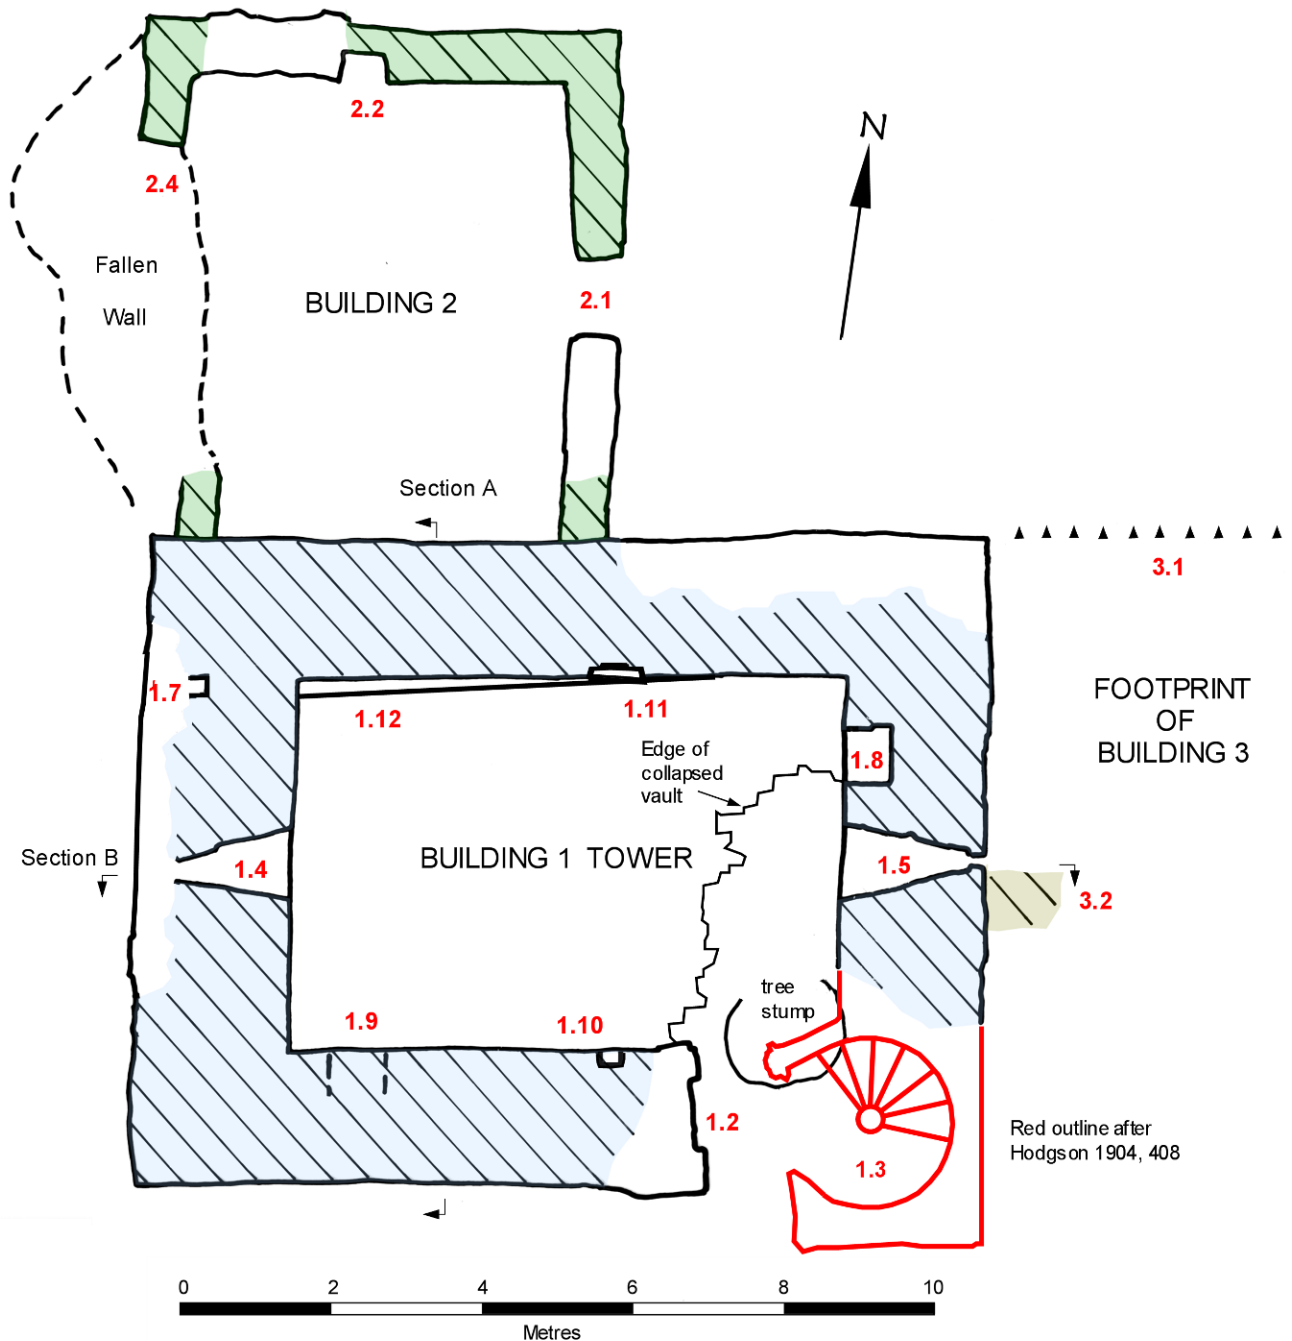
Plan of Overgrass Tower and adjacent remains (1: 100). Sections in this and succeeding drawings are hatched and toned.
